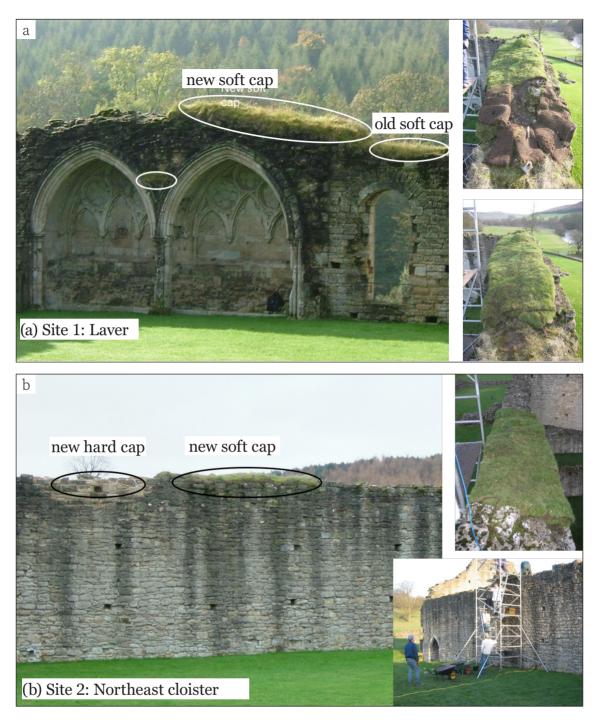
Location of newly installed soft capping at Kirkham Priory.
